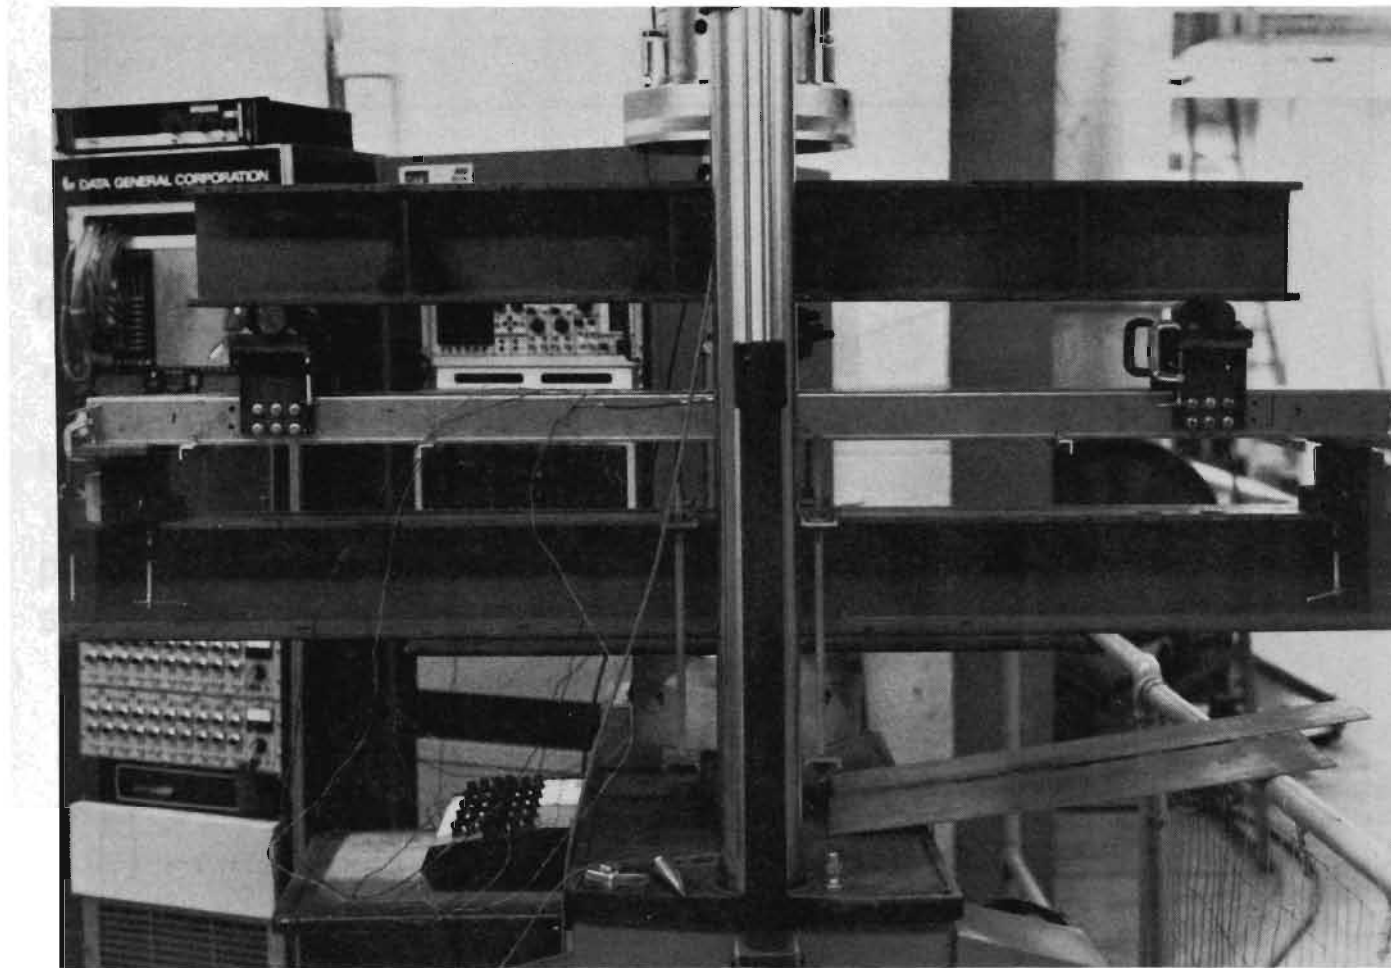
Photograph of Test Setup for Hat-Shaped Beam Specimen
